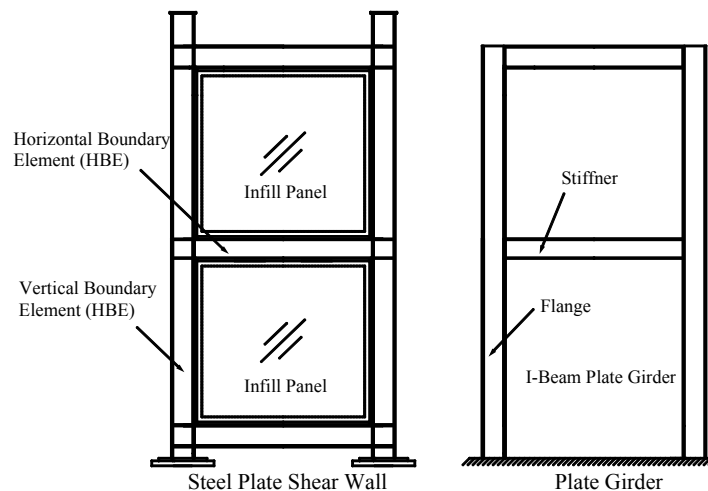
Typical Steel Plate Shear Wall and Analogous Vertical Cantilever Plate Girder
